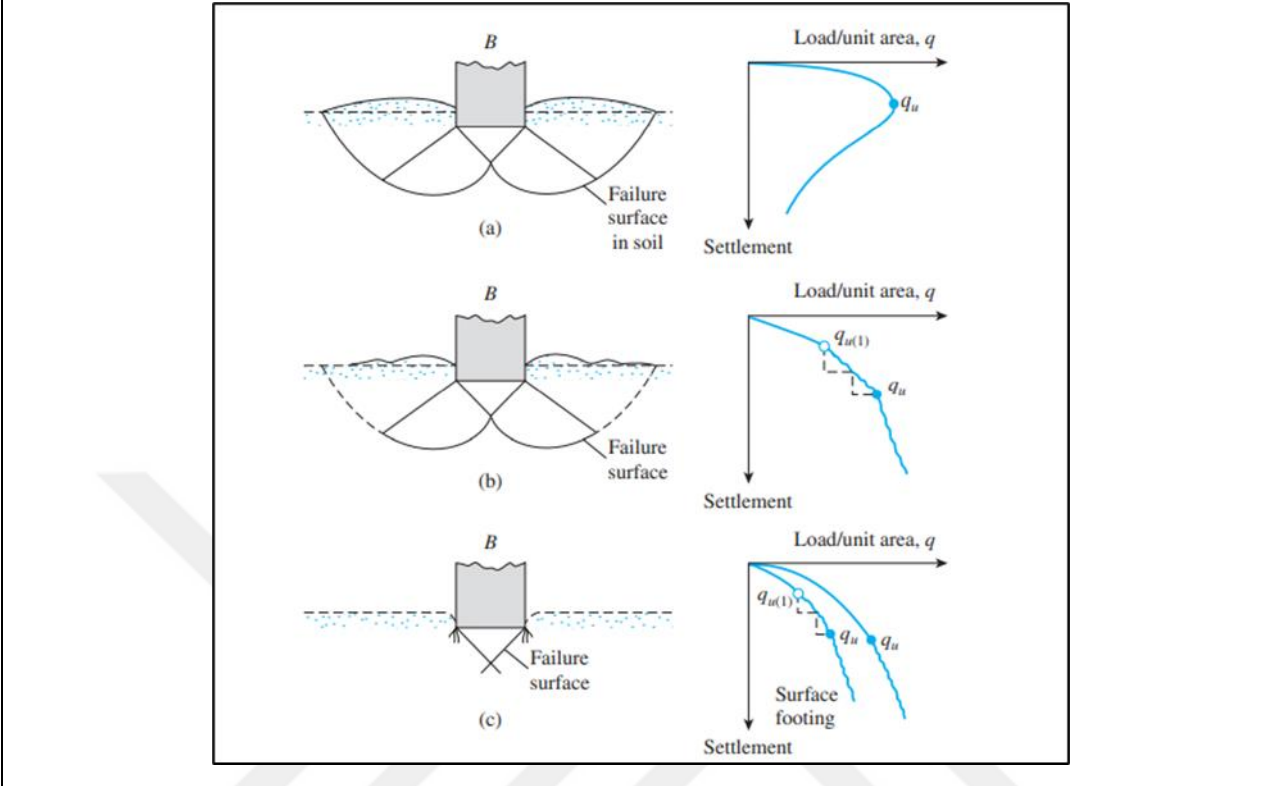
Nature Of Bearing Capacity Failure In Soil: (a) General Shear Failure; (b) Local Shear Failure; (c) Punching Shear Failure [49]
